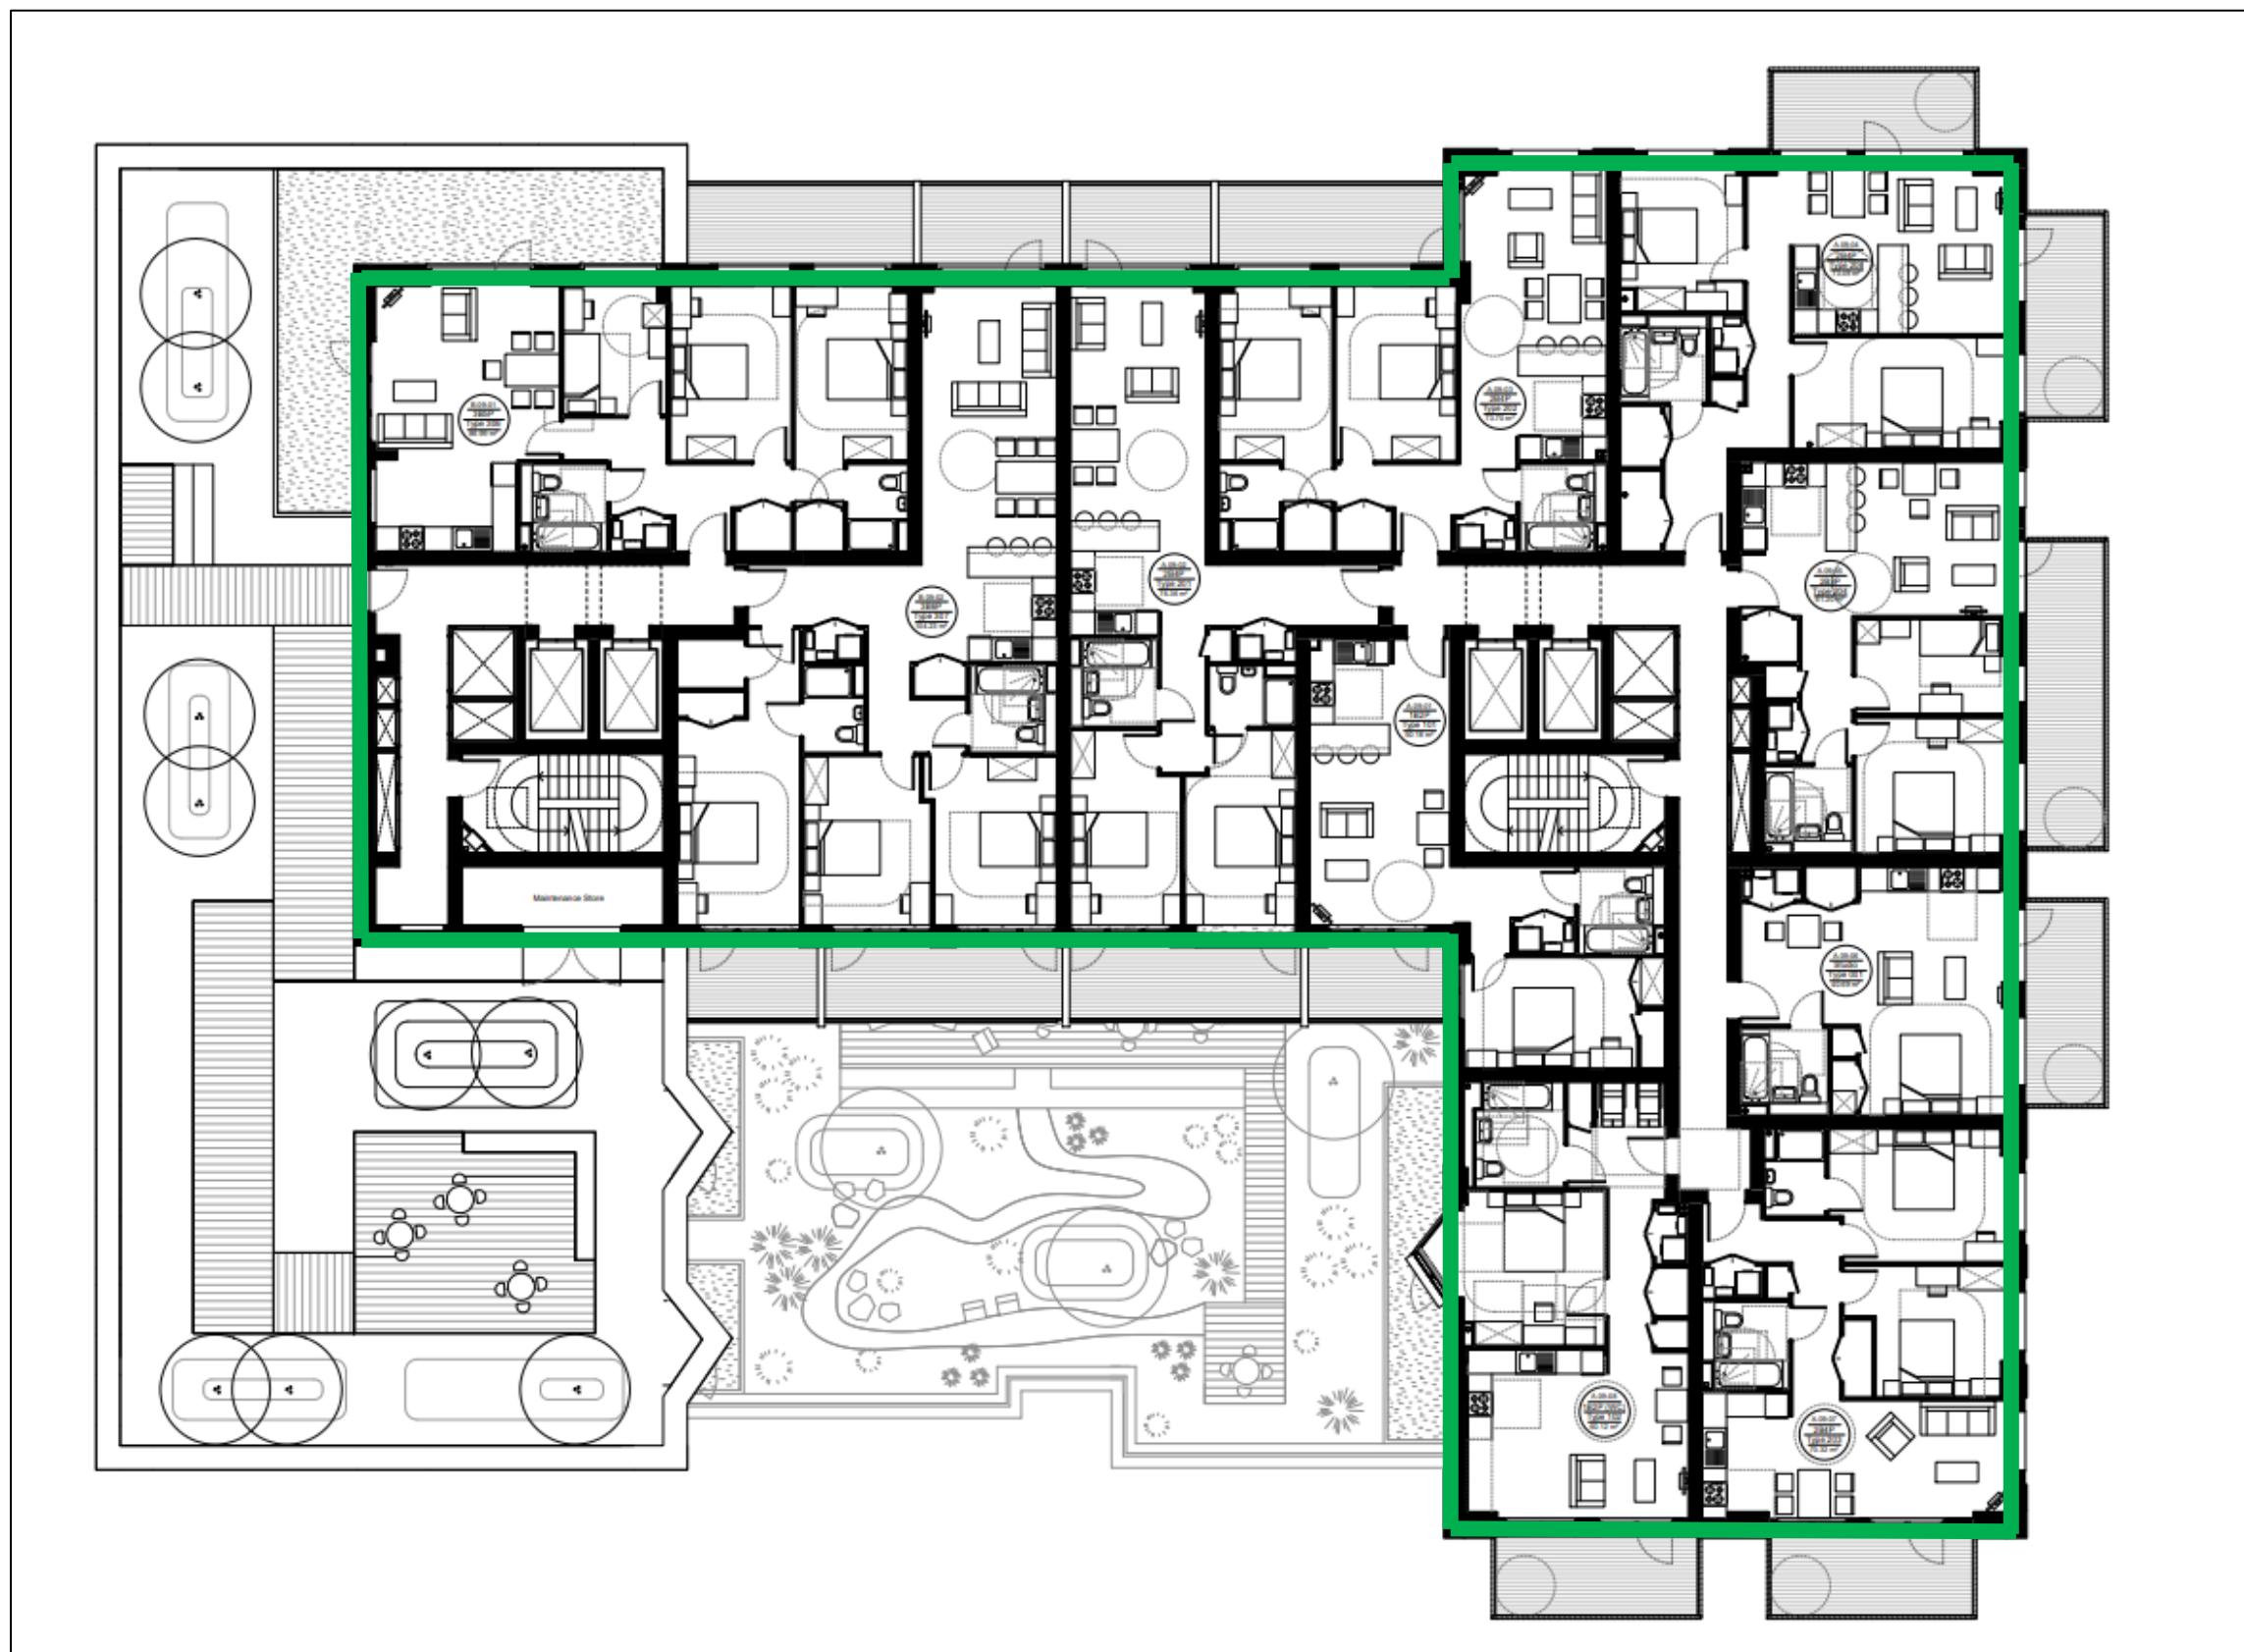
Acoustic glazing "Façade Zones" –Level 09
